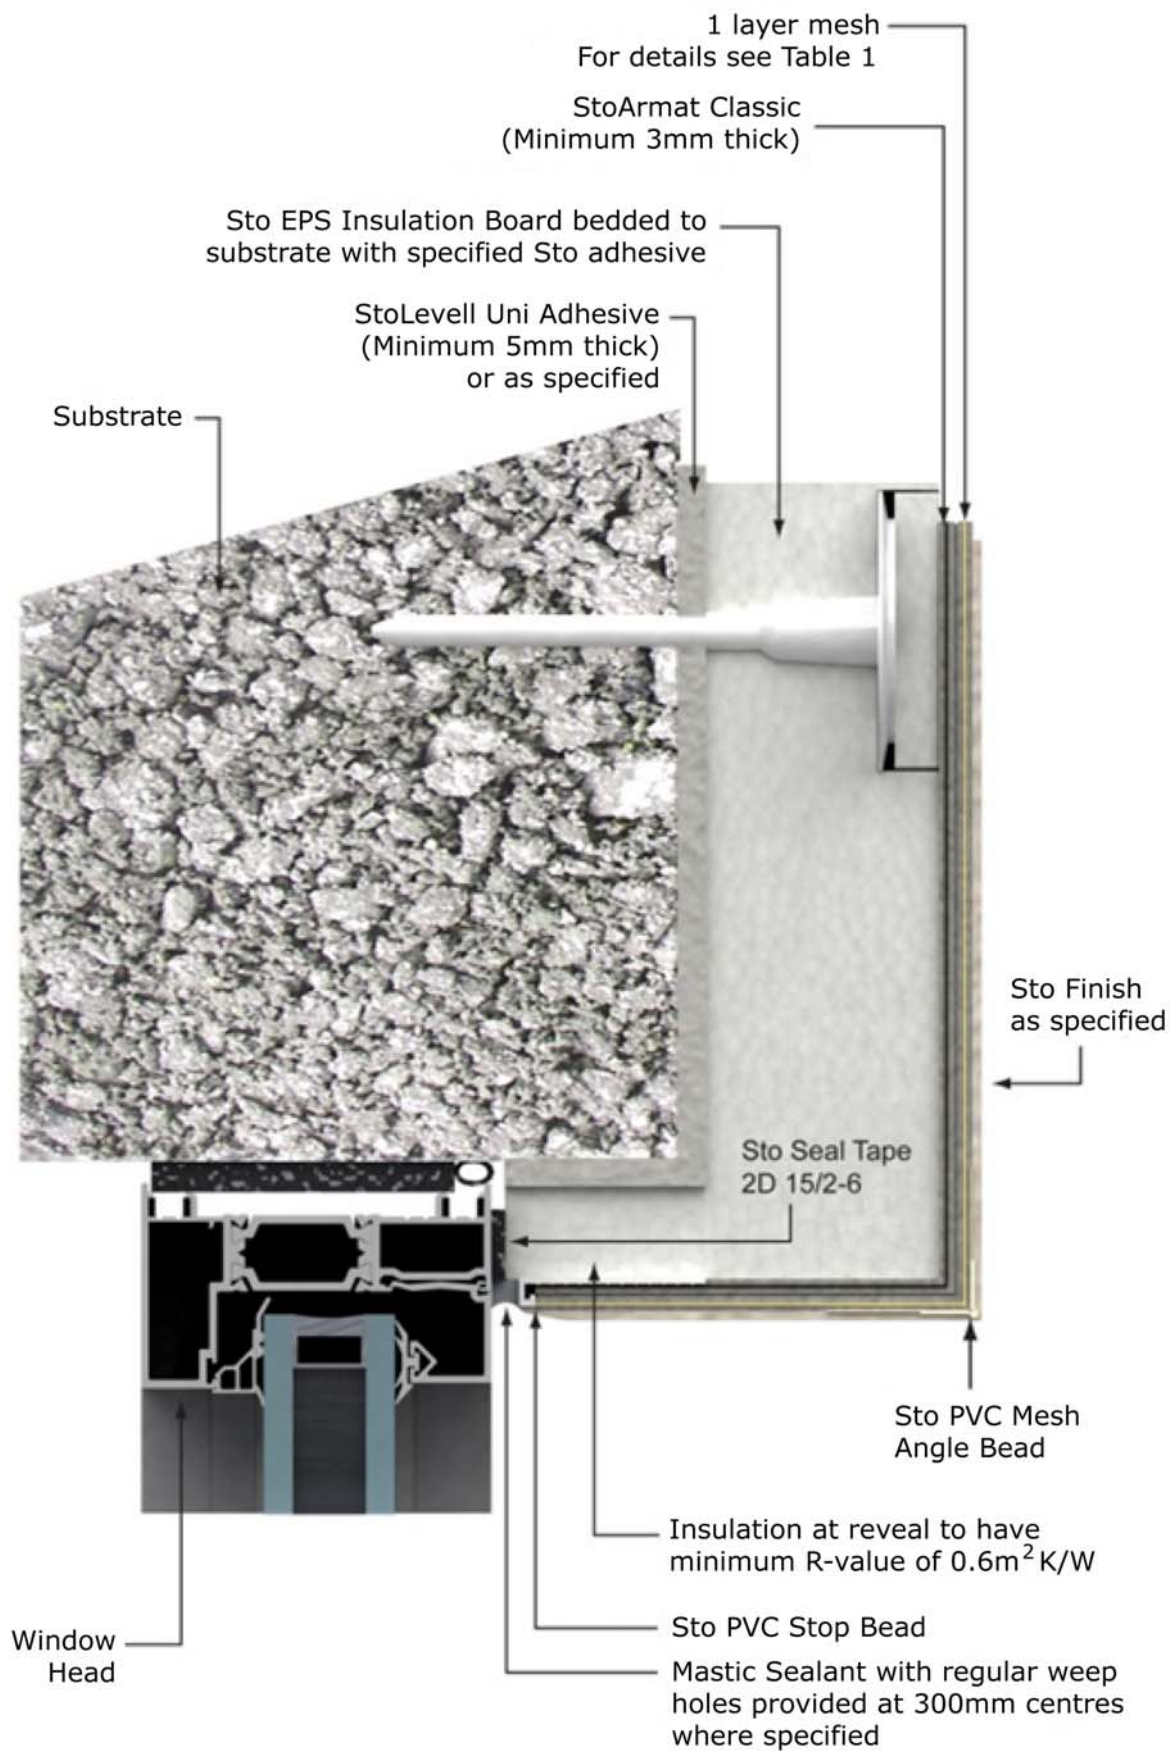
Typical Detail –StoTherm Retrofit Classic K – Window Head
